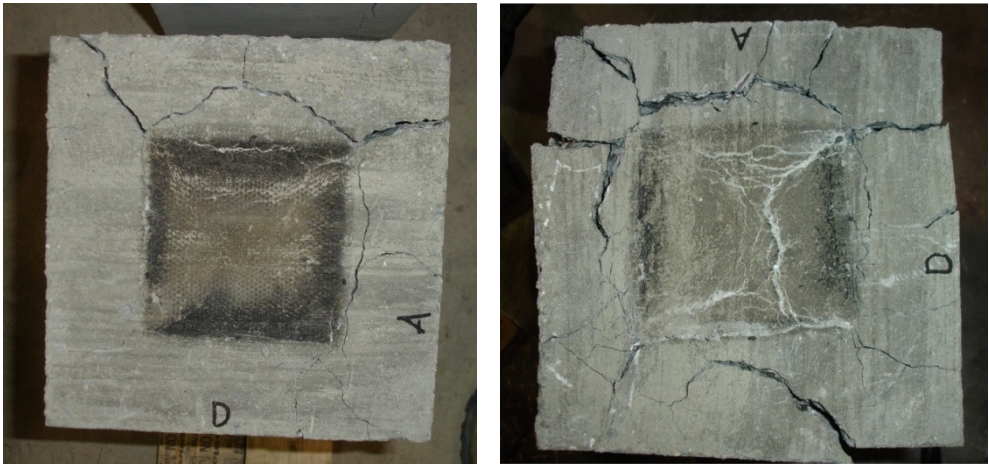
Top Surface after failure: 4 in. bearing pad
